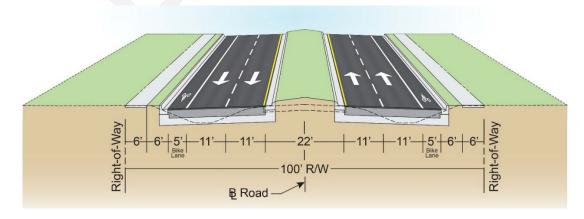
Nolte Road and Old Canoe Creek Road Reconstruction Areas Typical Section
